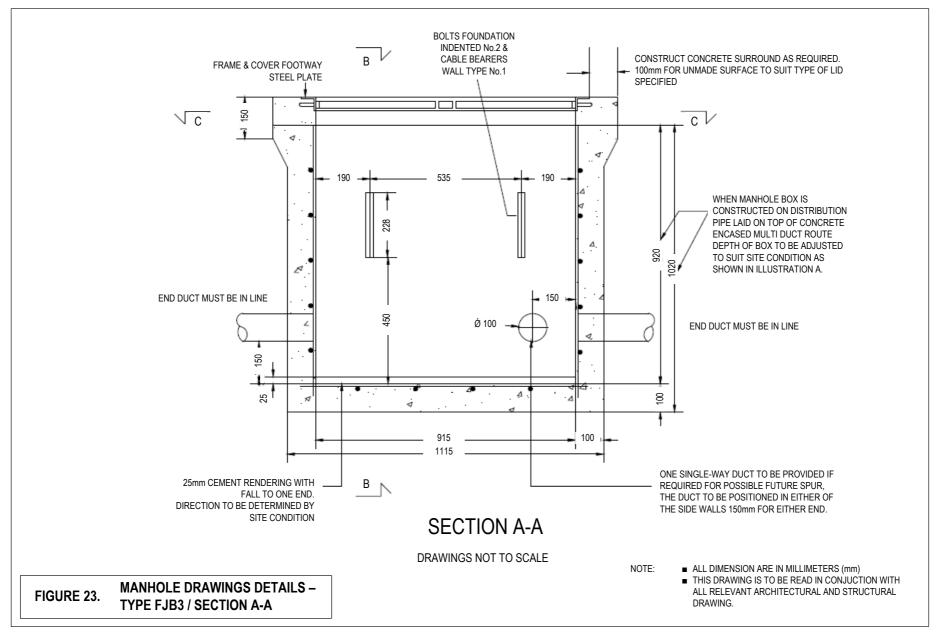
Manhole drawings details - Type FJB3 / section A-A
